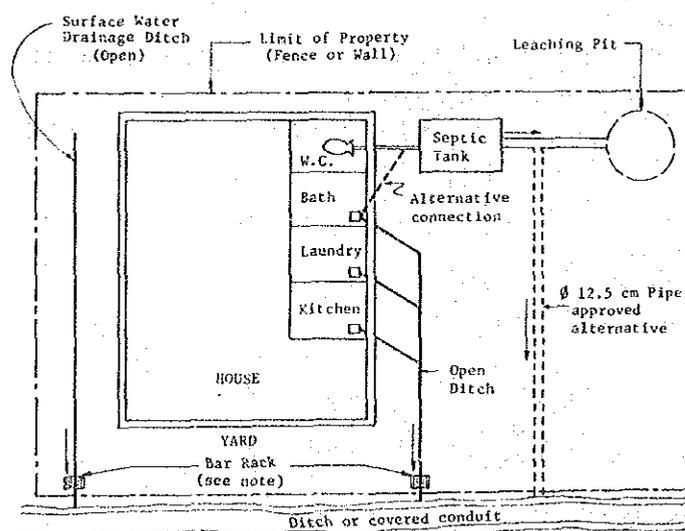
HOUSEHOLD WASTEWATER FACILITIES
